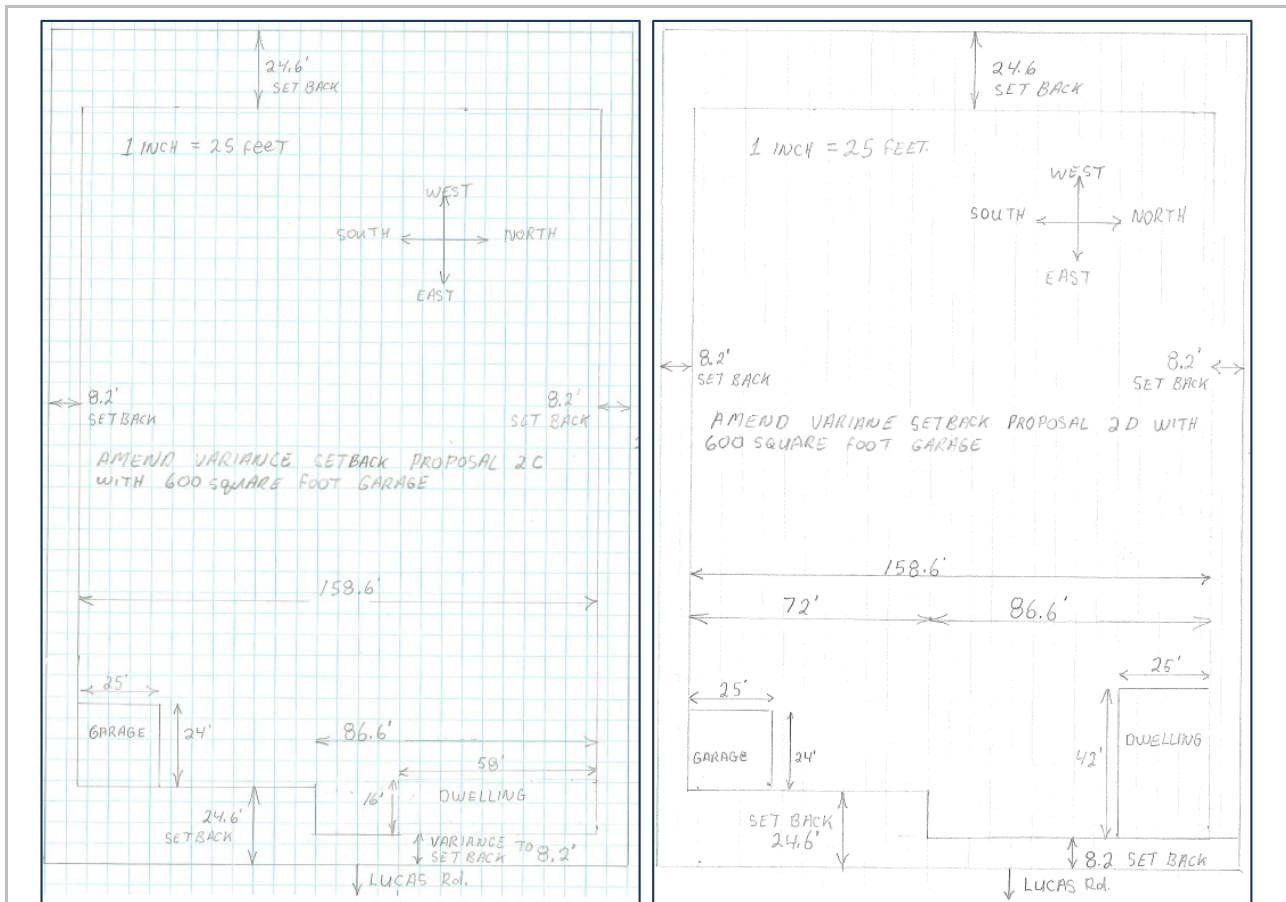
Proposed Site Plan – Option 1 and 2 (indicating possible orientations of the manufactured
